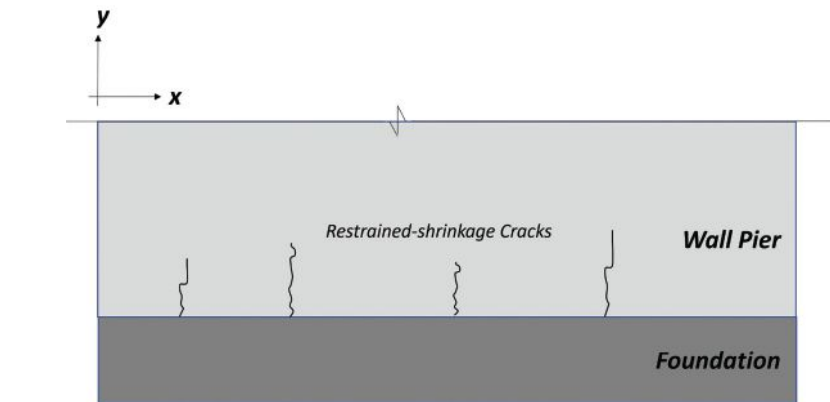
Possible cracking at a wall pier-to-foundation connection. All Figures: University of Texas at Austin.
